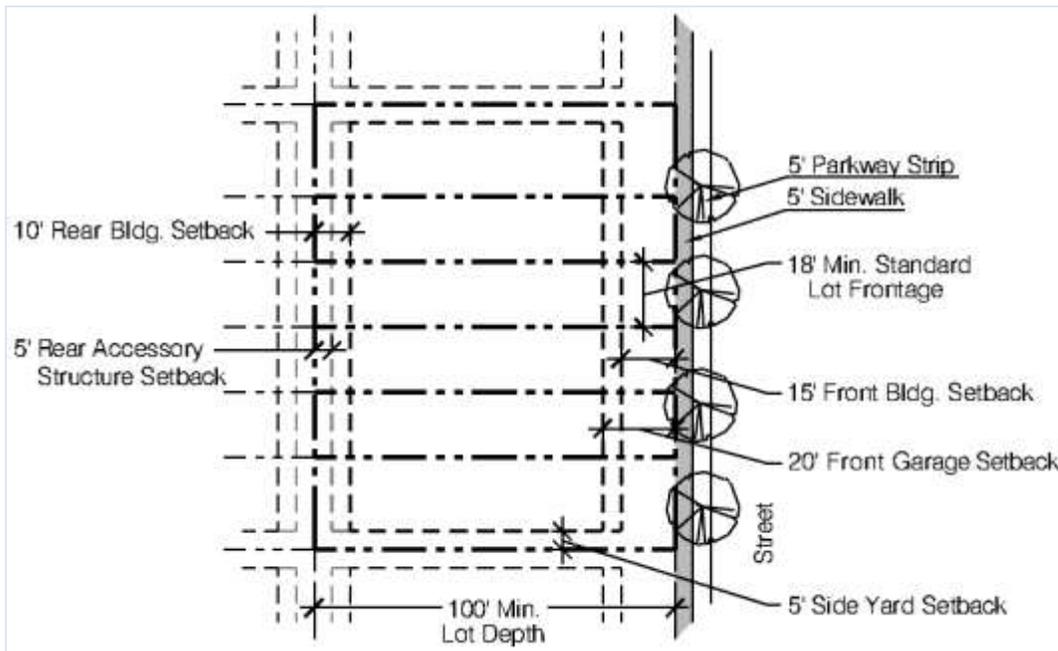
R-2 M SETBACKS - TOWNHOME LOT
